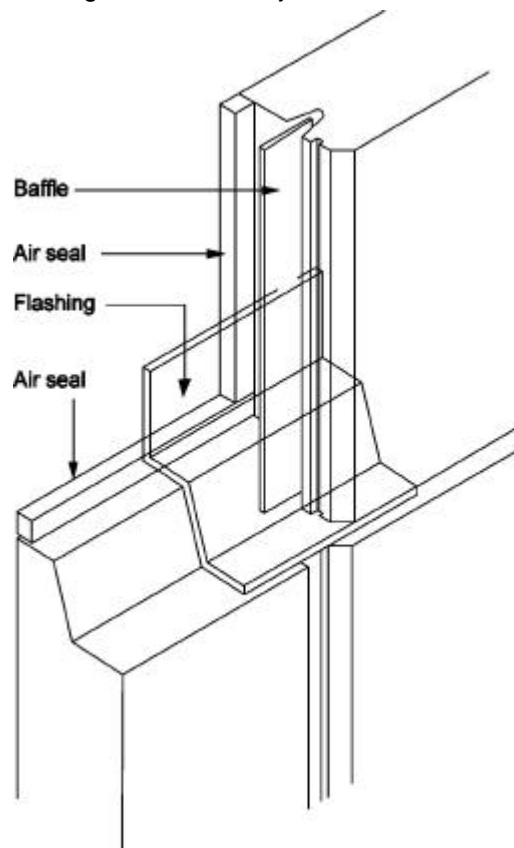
Typical intersection between horizontal and vertical two-stage joints in an external wall
